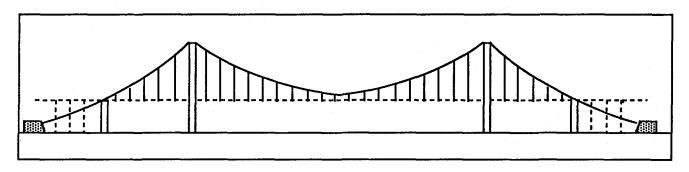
SUSPENSION BRIDGE WITH SECONDARY PYLONS AND THE MAIN CABLE CONTINUED TO LOW ANCHOR BLOCKS
